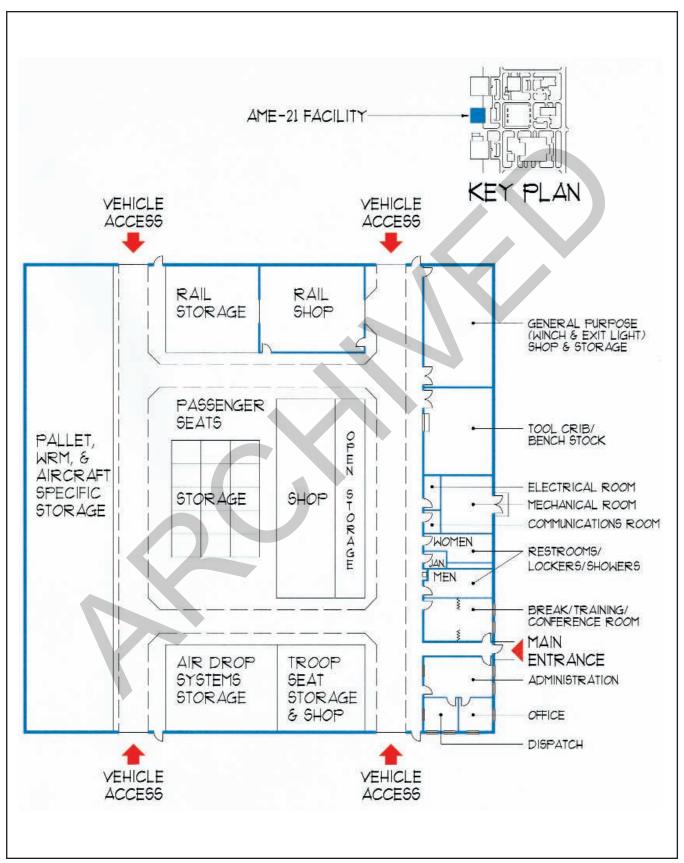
B: Concept Floor Plan for the Alternate Mission Equipment -21 Facility.
